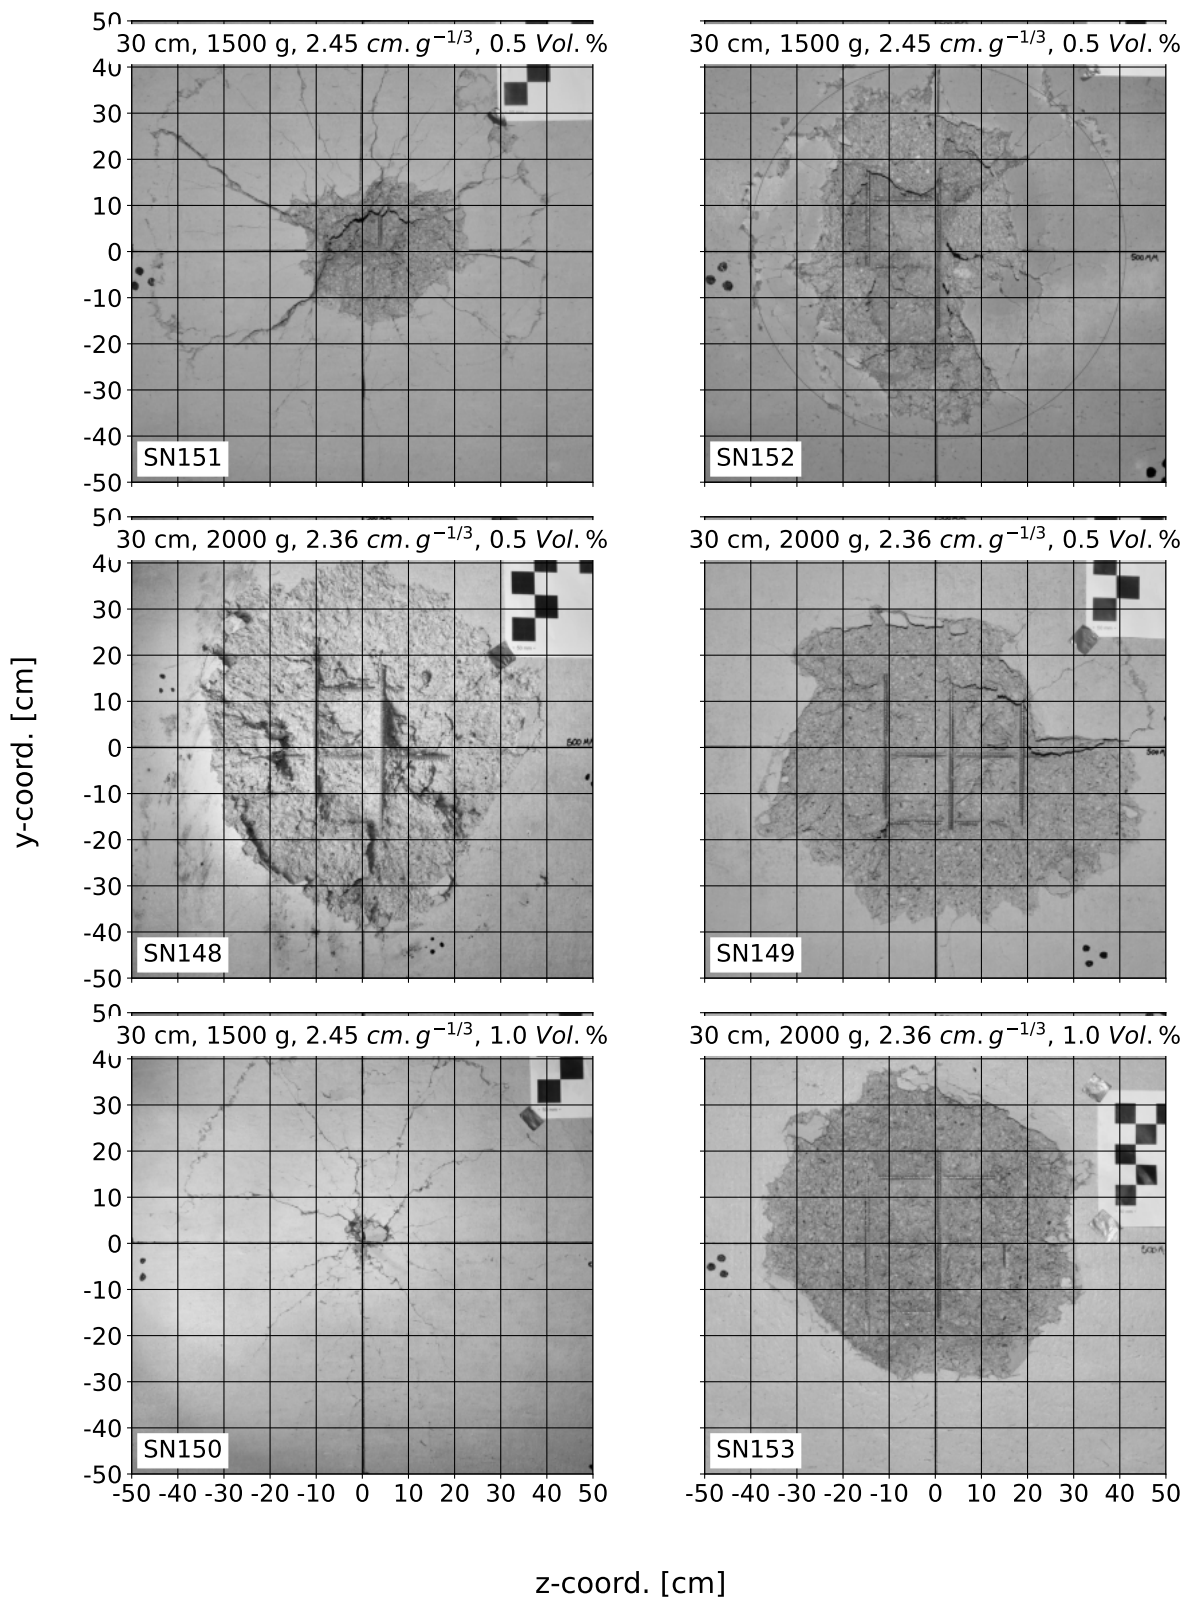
Spalling crater (with steel fibers, part 1)
